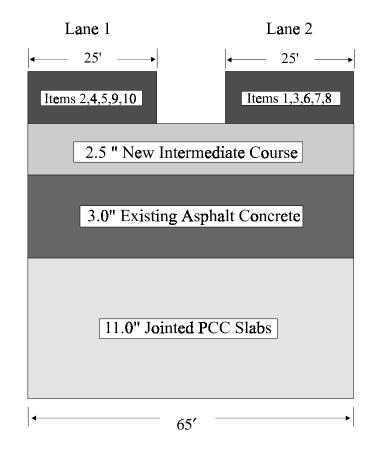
TYPICAL CROSS SECTION OF TEST SECTION
